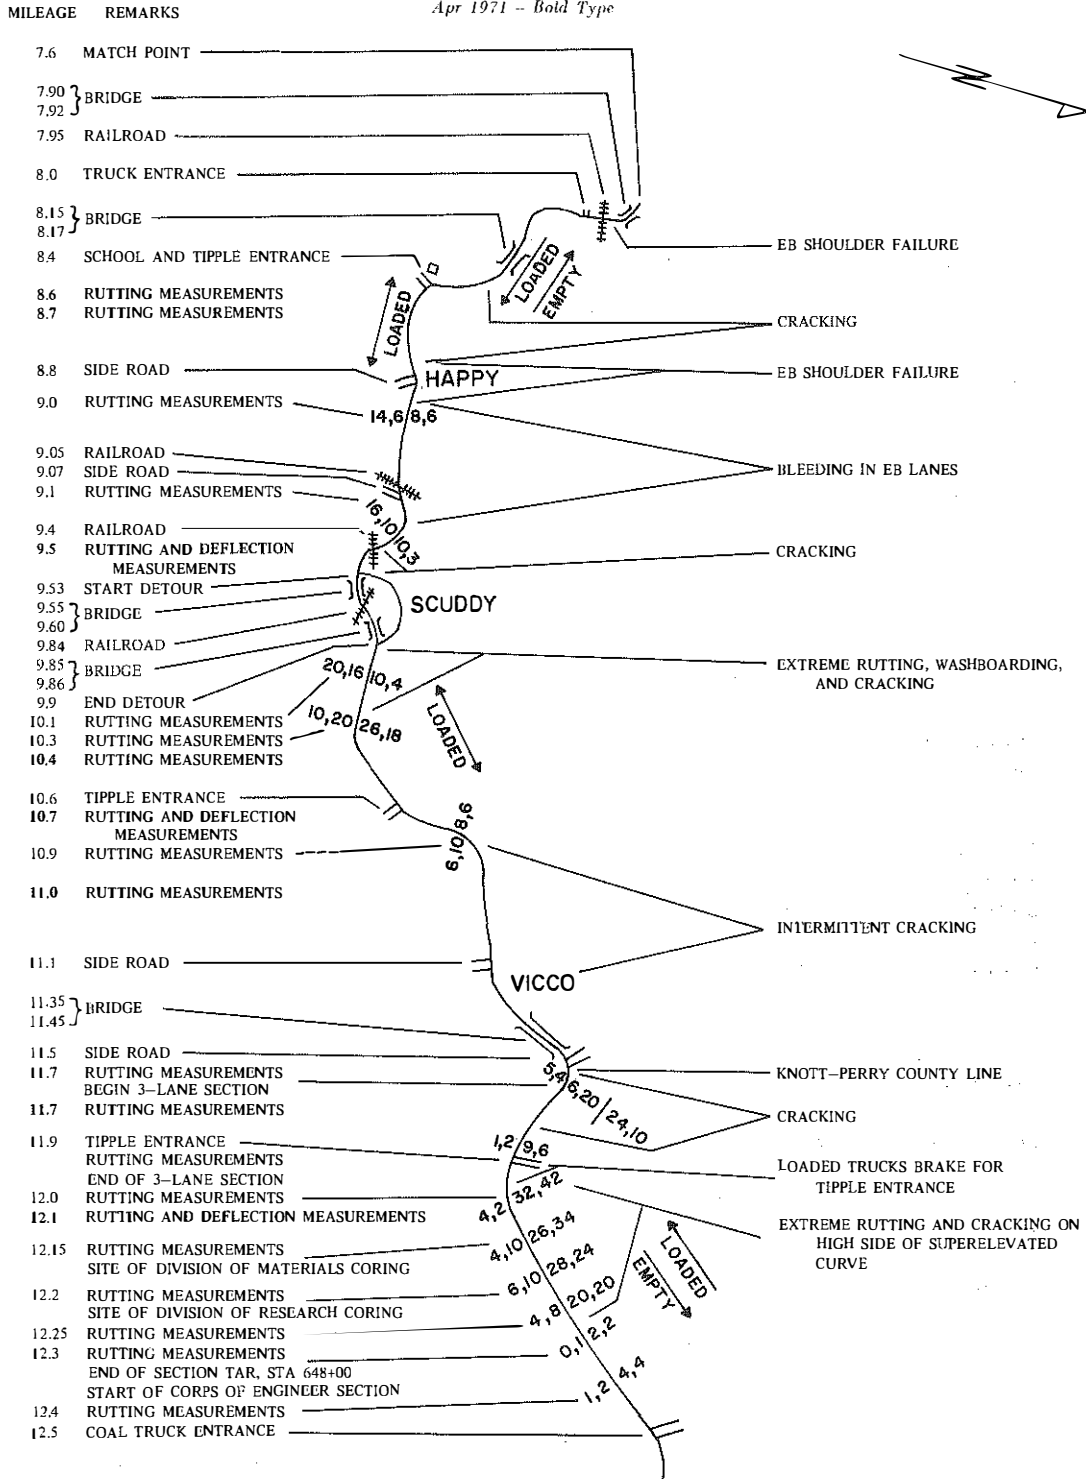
Sketch of Pavement Defects on Sections C-1 and TAR -- Hazard to Sassafras.
